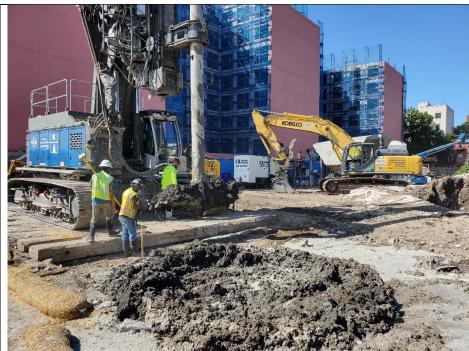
GSI attempting to repair pump for foam dispenser, facing northwest.
